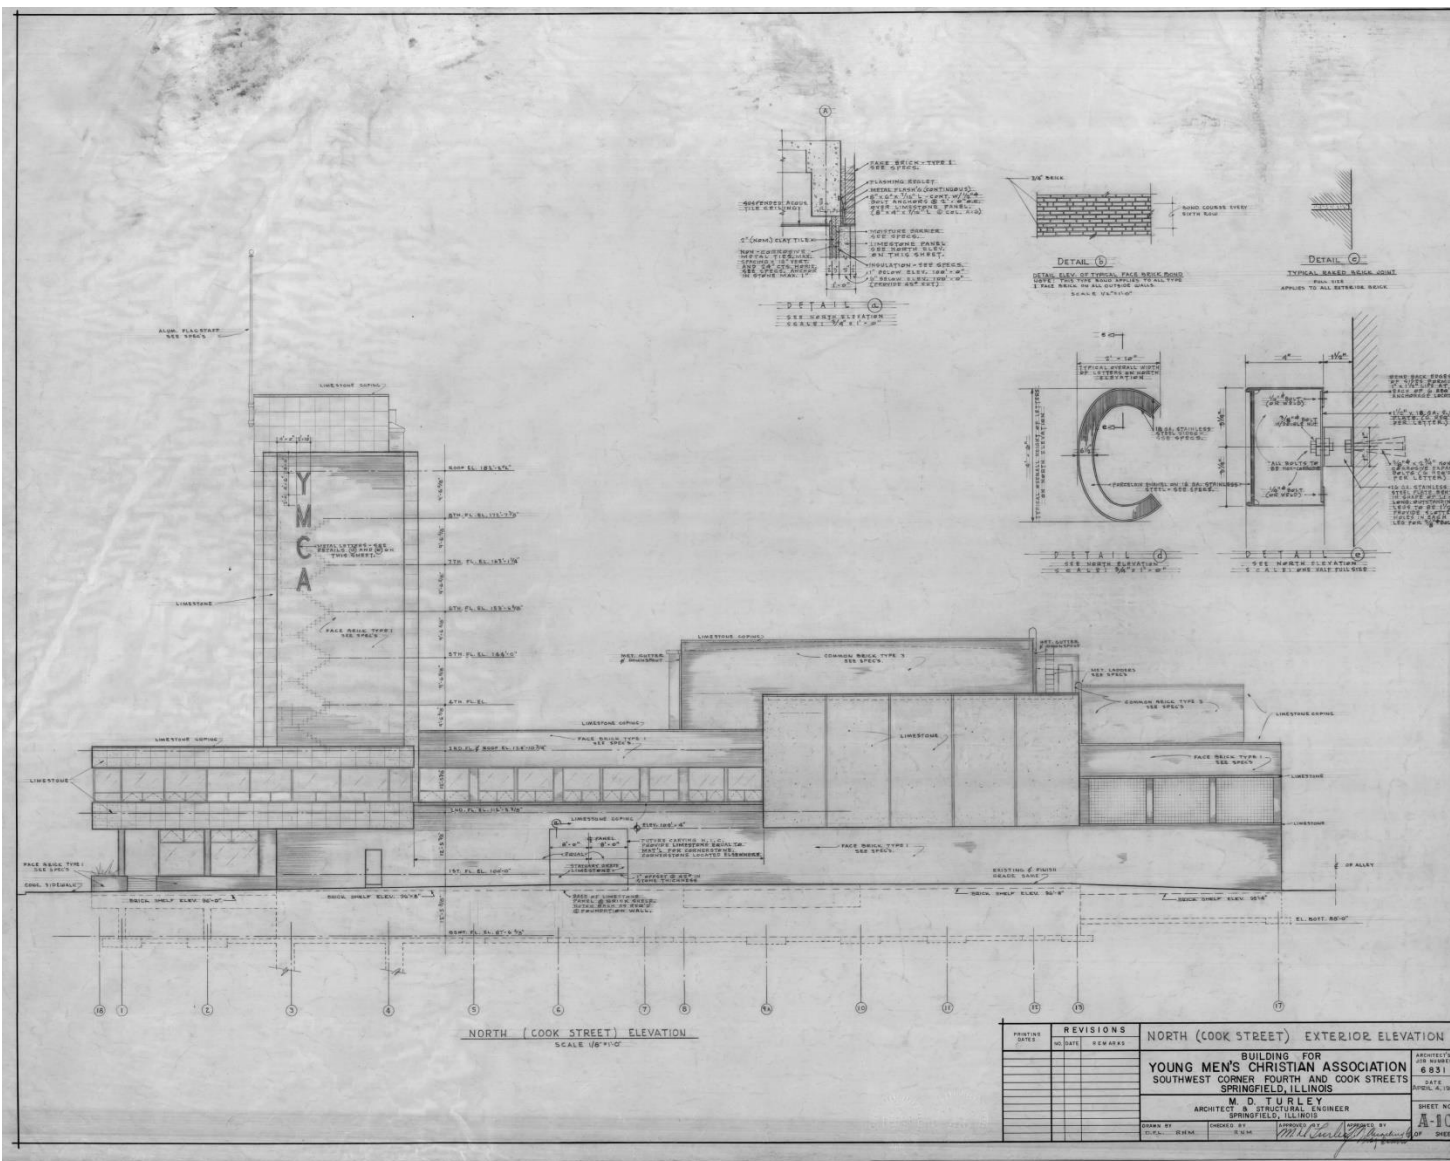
North (Cook Street) Exterior Elevation, Building for Young Men's Christian Association (Turley 1958; Sheet No. A-10).
